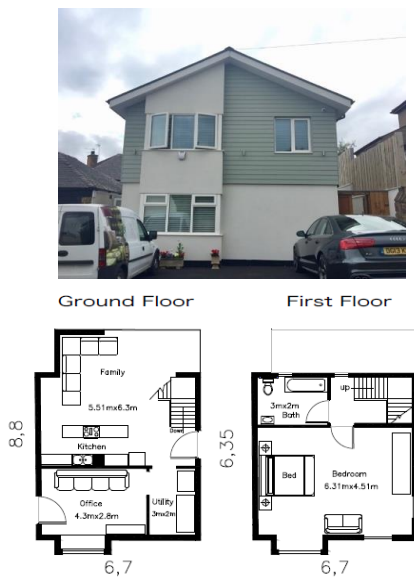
Front elevation and floor plans of the MgOSIP house in UK.
